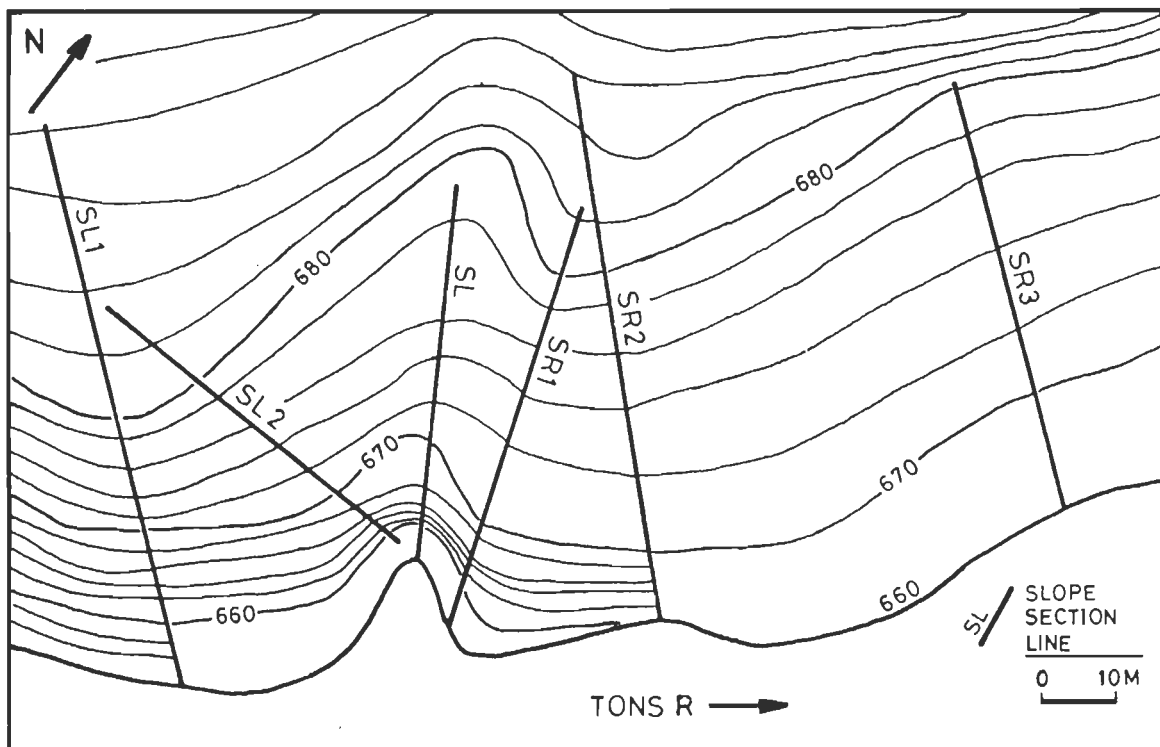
SLOPE SECTIONS AT POWER HOUSE SITE, ALONG WHICH STABILITY ANALYSIS HAS BEEN CARRIED OUT.
